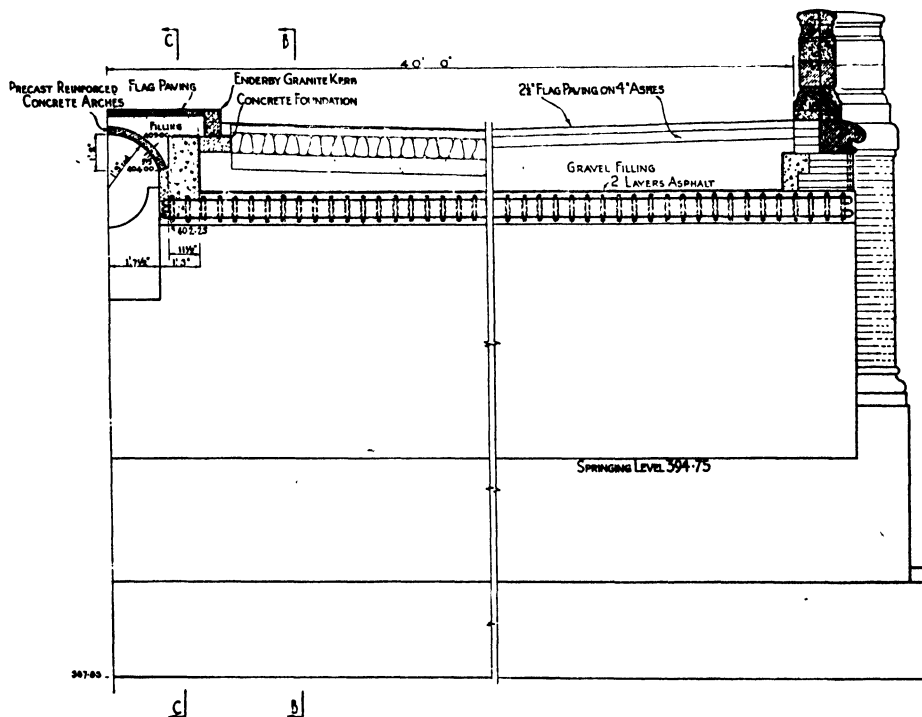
SECTION THROUGH CENTRE OF ARCH.
